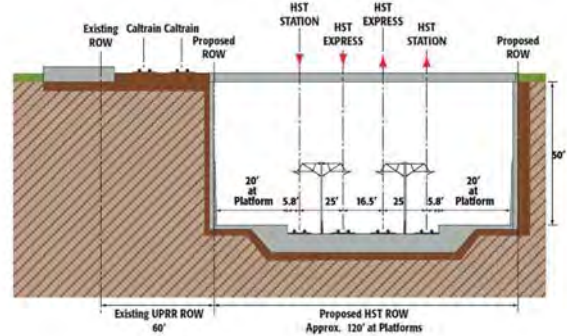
Trench Section - Downtown Gilroy Station Area Plan, OPPORTUNITIES AND CONSTRAINTS REPORT, PUBLIC REVIEW DRAFT 10.23.15 - PlaceWorks, 2015
